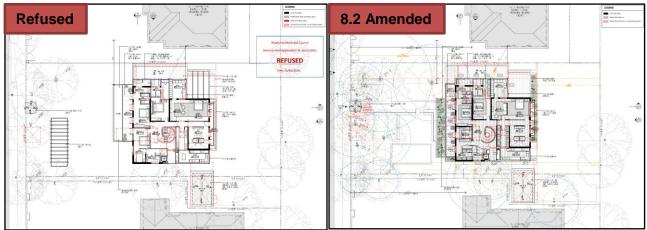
(left) & 6 (right). Refused and amended Level 1 Plan. Source: Refused and Amended Architectural Plans
